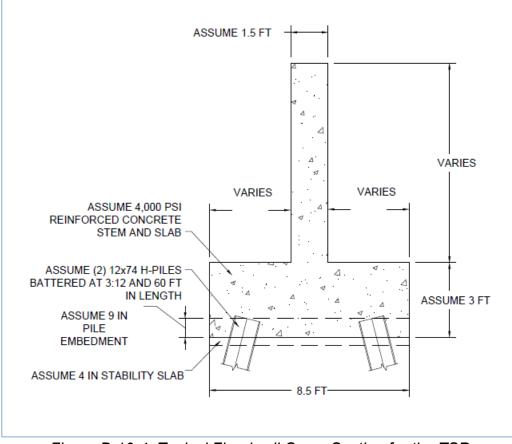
Typical Floodwall Cross Section for the TSP
